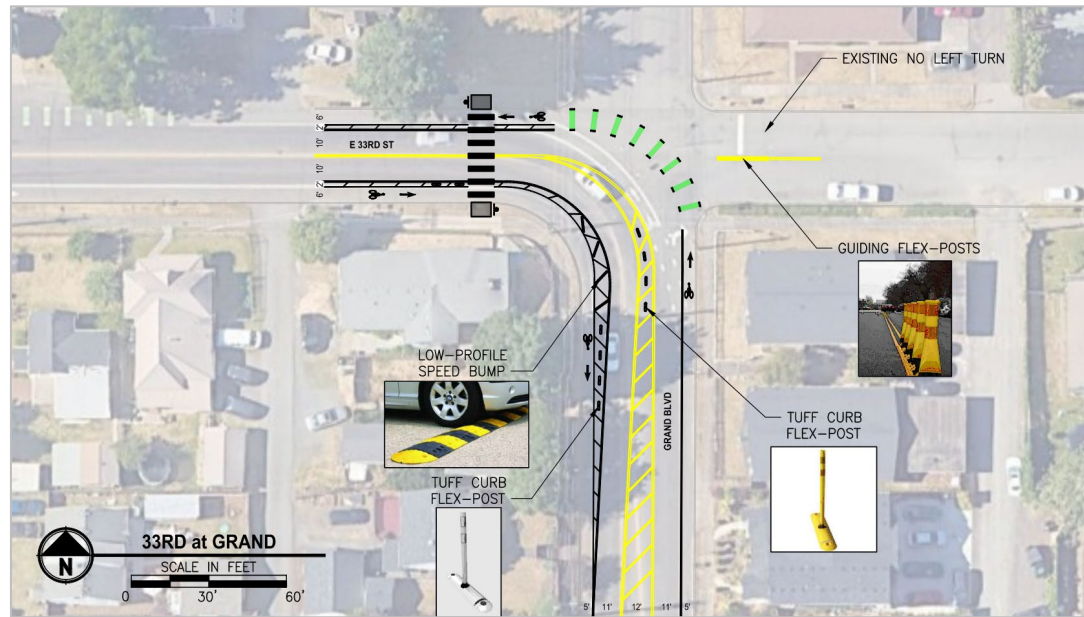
Proposed Intersection Improvements at 33rd Street and Grand Boulevard
